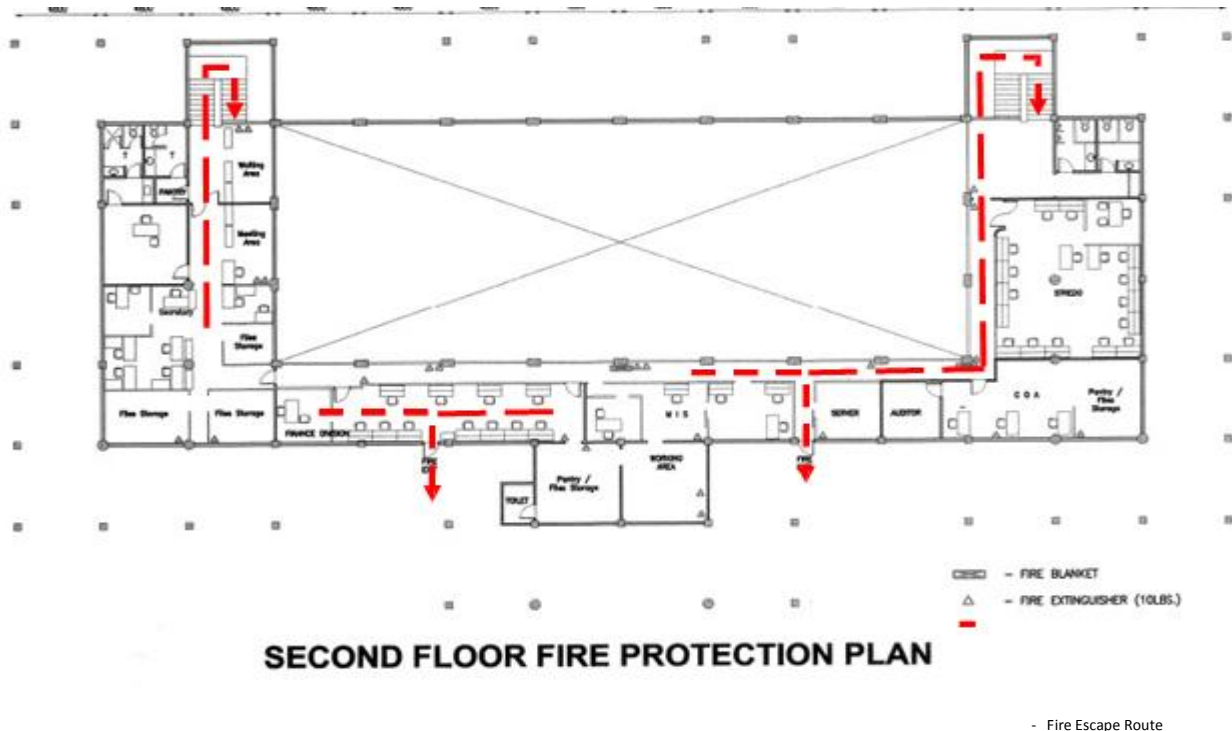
Golden Shell Pavilion 2nd Floor Evacuation Plan
